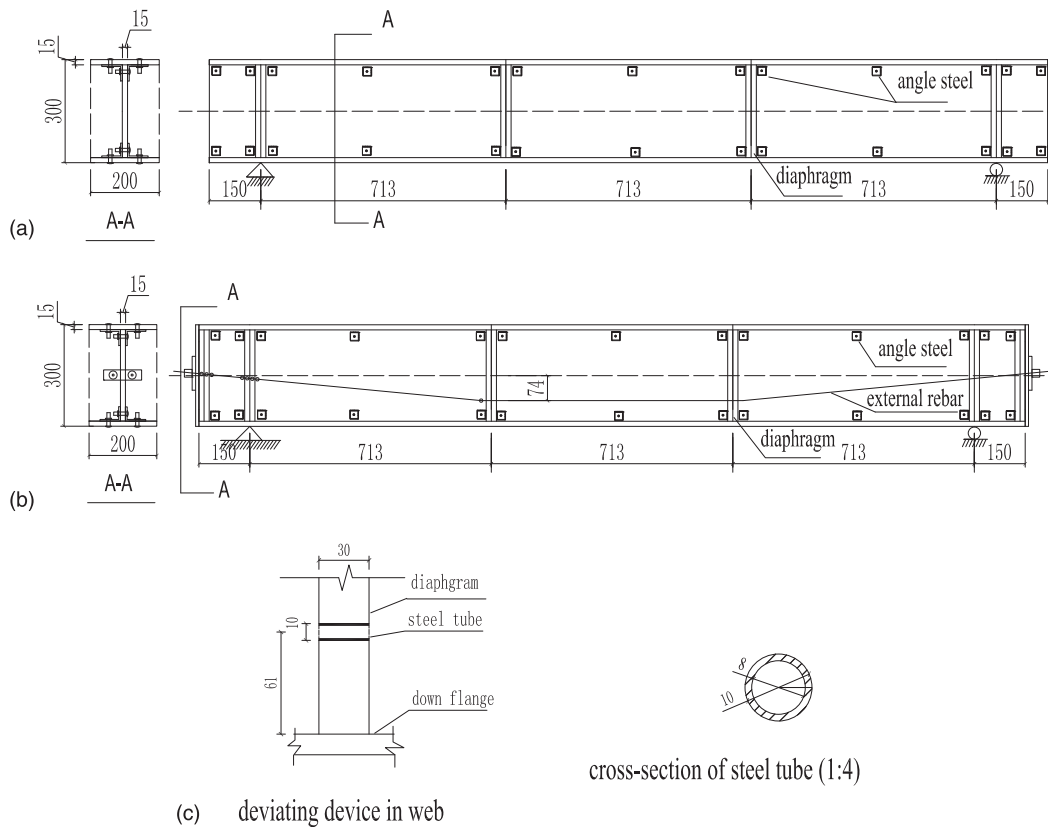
Specimen configuration of bamboo composite I-shaped beam (mm): (a) configuration of I-shaped bamboo beam without reinforcement (mm); (b) configuration of I-shaped bamboo beam with reinforcement (mm); (c) detail of steel tube as deviating device for external tendon (cm)
